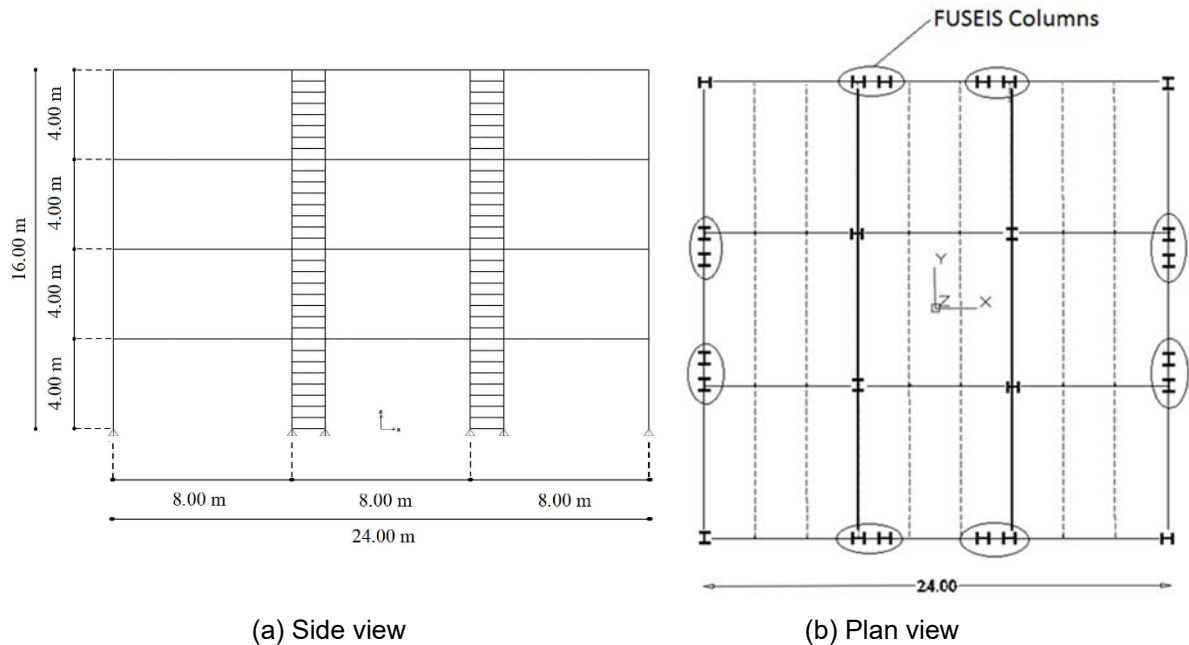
Side and plan view of the building - FUSEIS systems position
